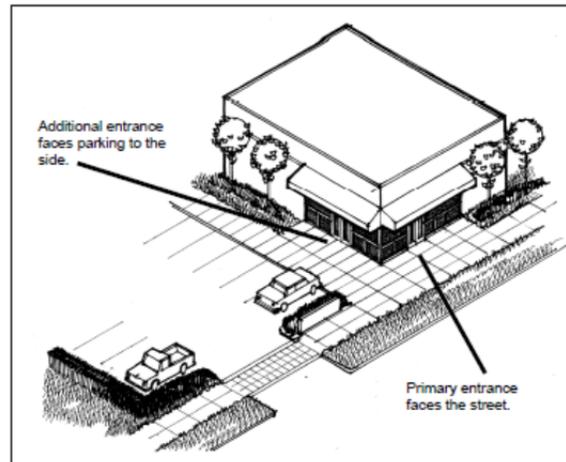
Figure A. A good example of a building placed close to a public street with strong pedestrian connections between the sidewalk and building entrances.
